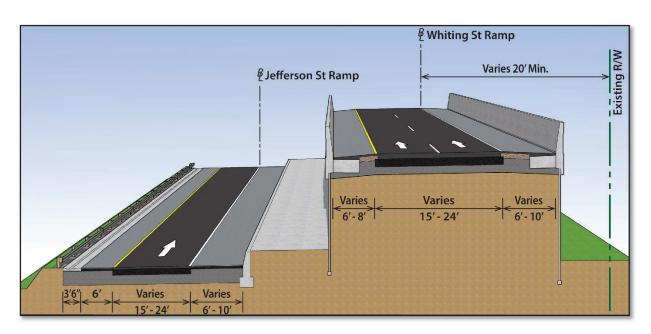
Proposed Typical Section – Whiting Street Off-Ramp (On MSE wall) and Jefferson Street On-Ramp
